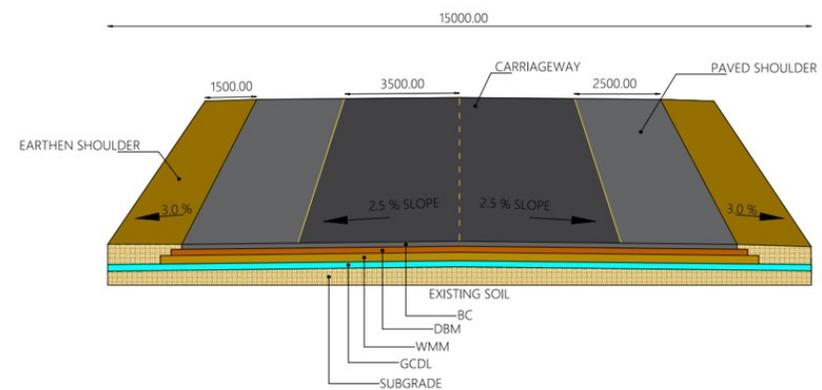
Typical Cross Section of 2 Lane Pavement with GCDL
